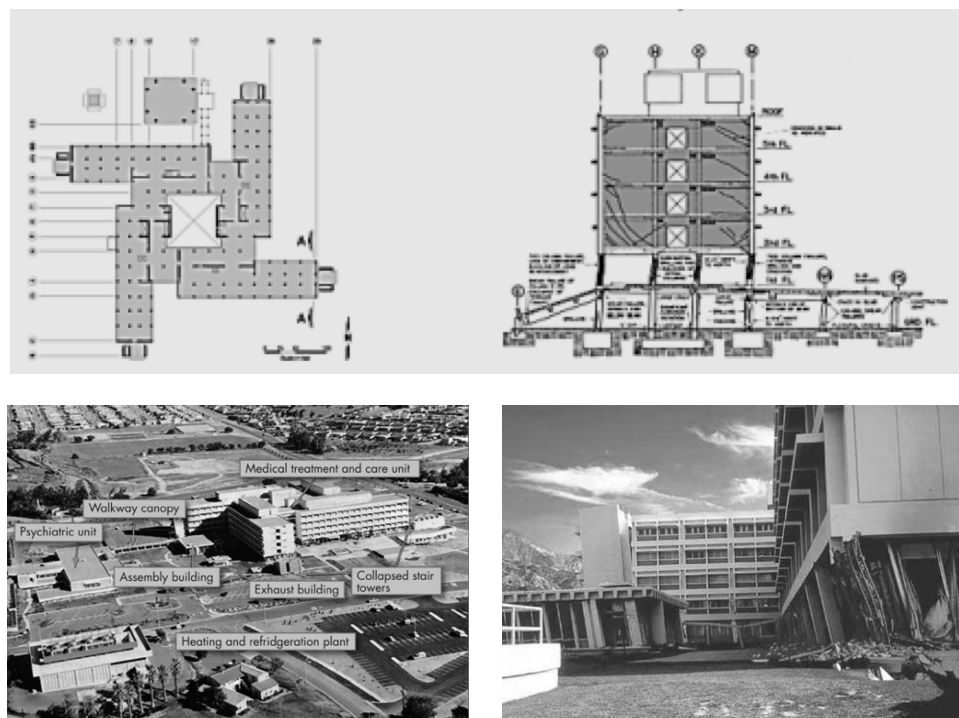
View in plan and cross section of the Olive View Hospital (above); structural damage experienced after the San Fernando earthquake: collapse of the parking, collapse due to soft-storey mechanism and overturning of the stairwell (below).
